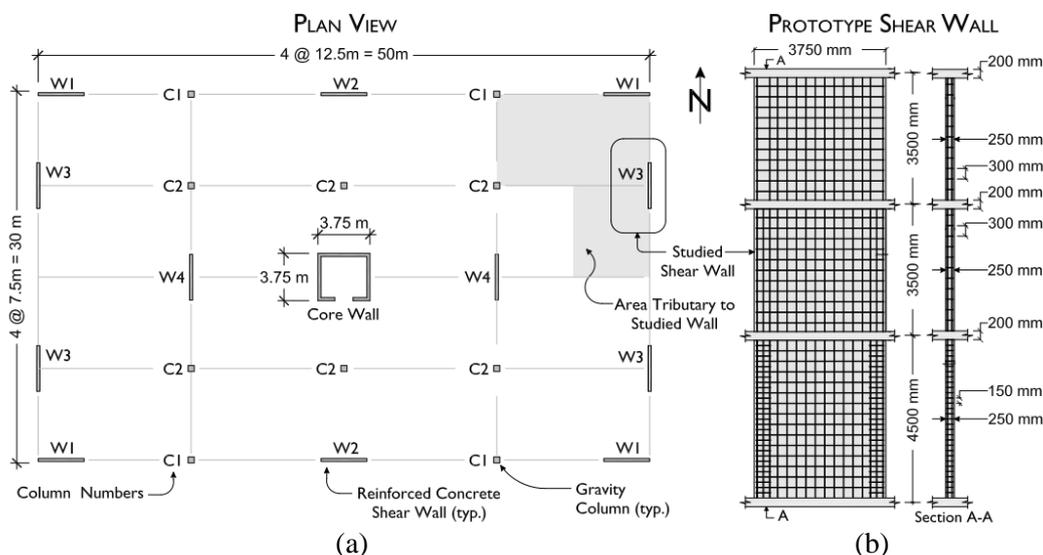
Three-storey prototype shear wall building: (a) floor plan; (b) typical shear wall detail
